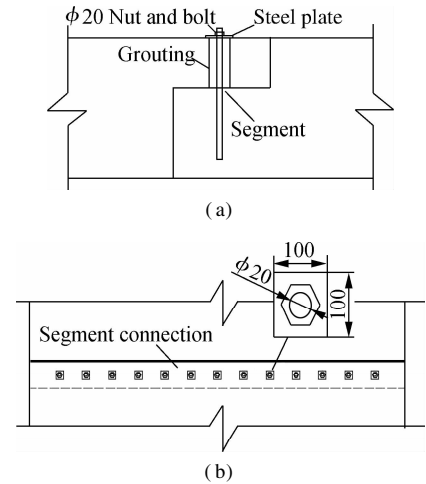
Bridge deck splicing structure (unit: mm). (a) Horizontal view; (b) Vertical view
